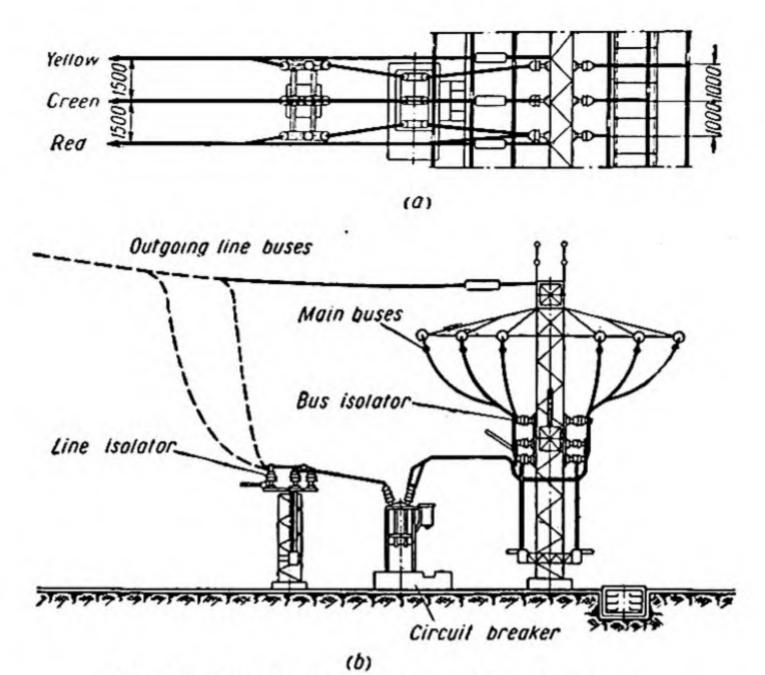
Outgoing line in an outdoor substation: a—plan view; b—sectional elevation
